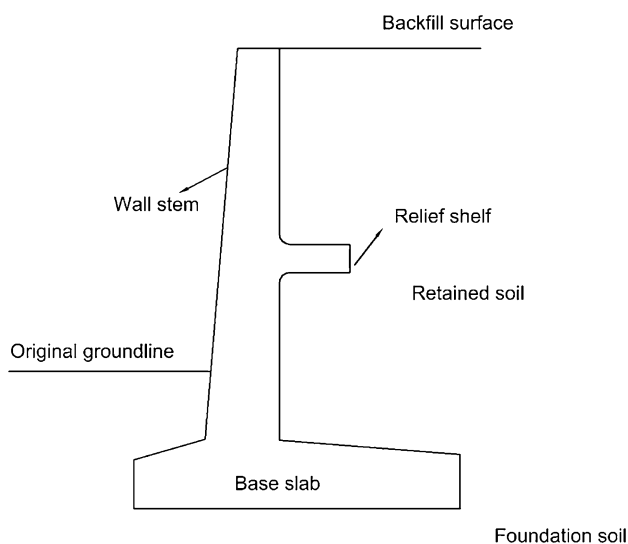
A typical sectional view of a retaining wall with a relief shelf.
